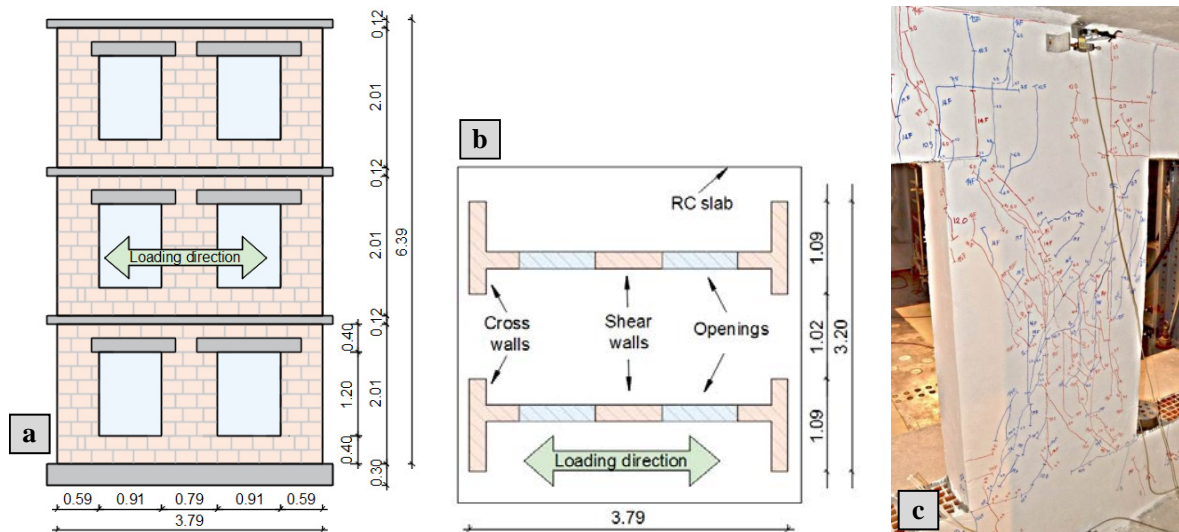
View of the model (a), floor plan (b) and damage pattern on a pier (c).
